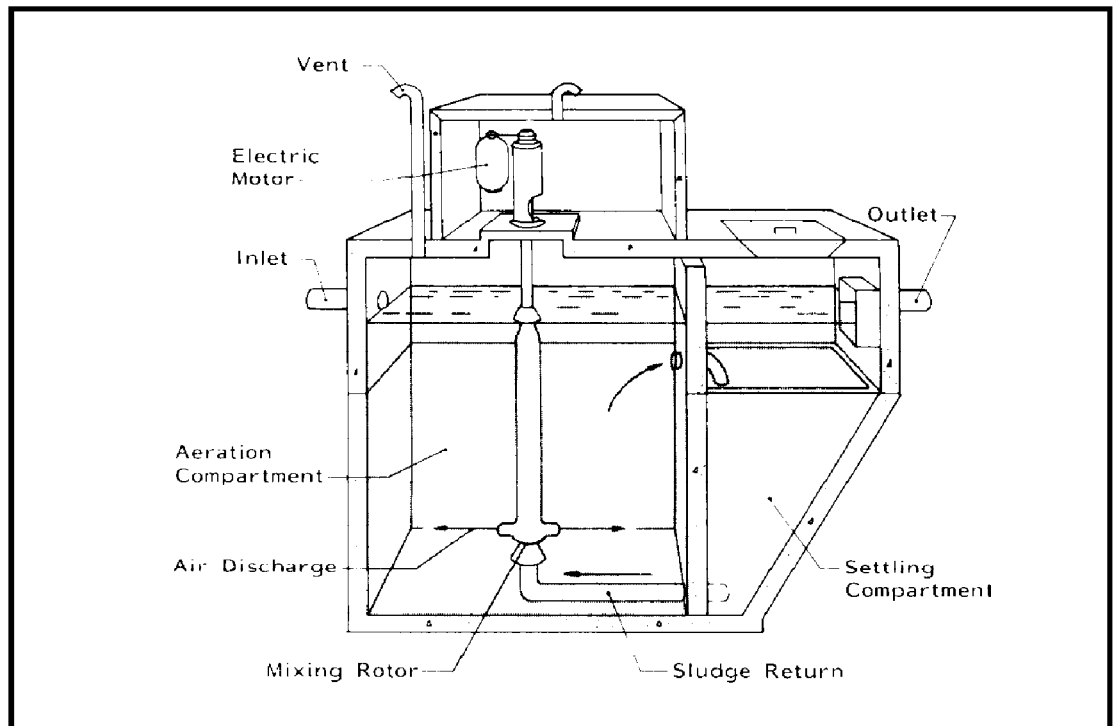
Aeration tank of a household aerobic treatment system. Source: *Onsite Domestic Sewage Disposal Handbook, MWPS-24, Midwest Plan Service, 1982.
